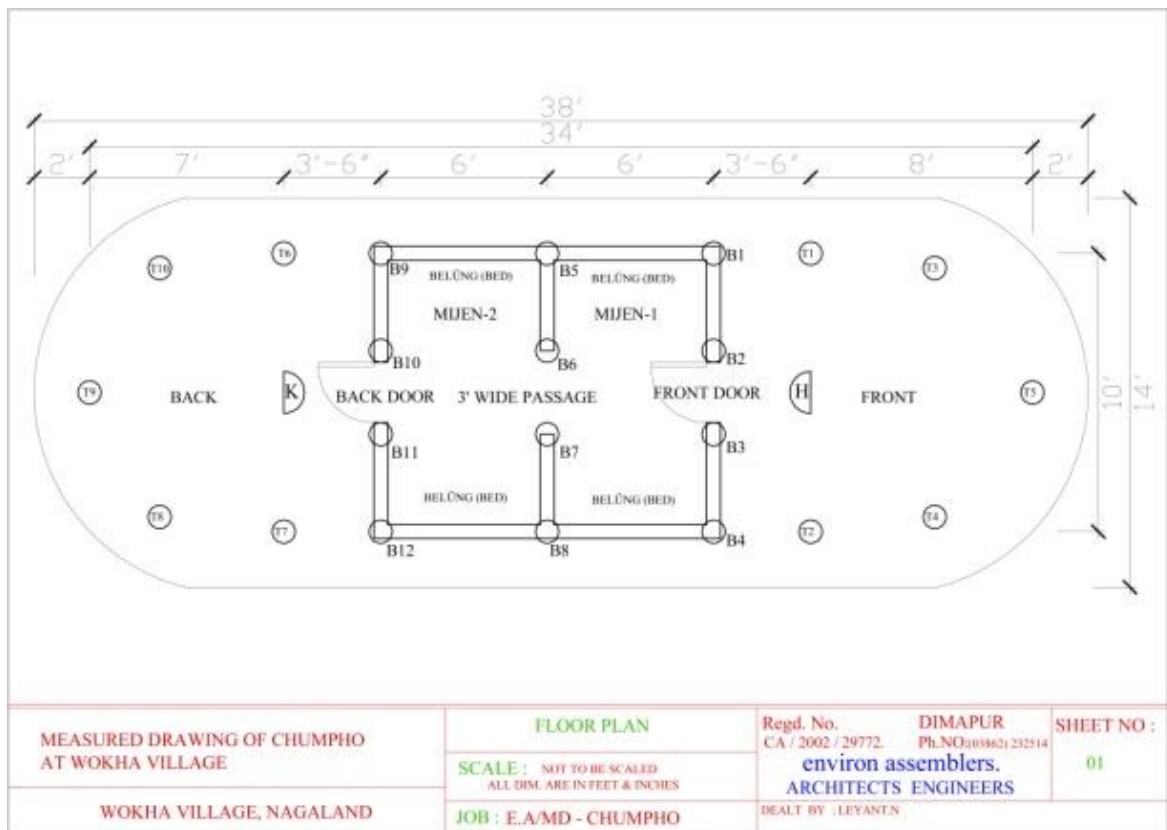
Floor Plan of the Chumpho (Morung) construction.
